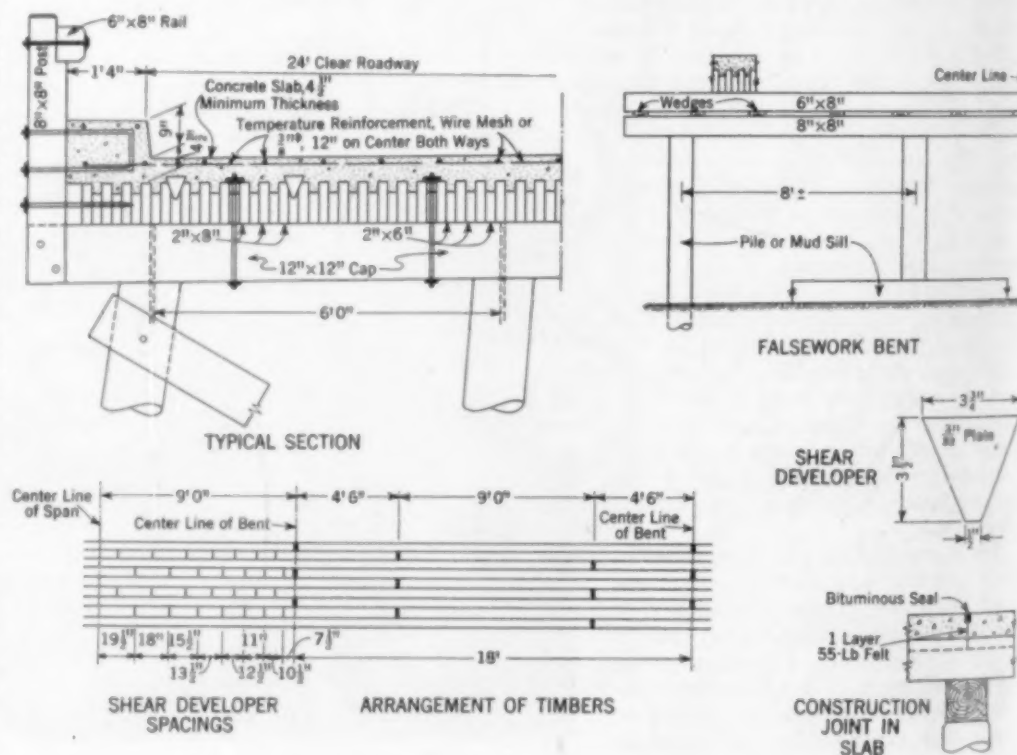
GENERAL DETAILS OF A TYPICAL SPAN
